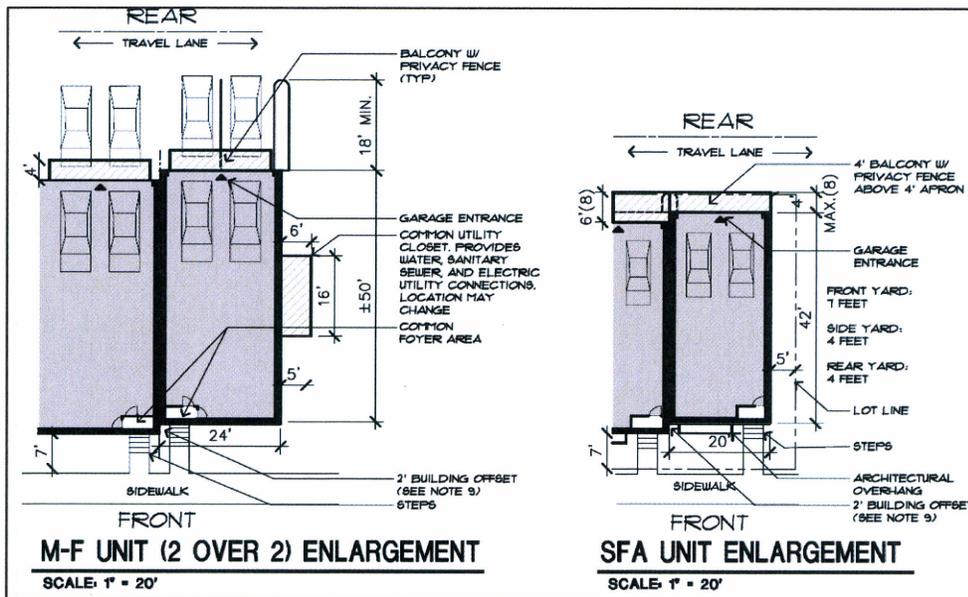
Detail of Garages- CDP/FDP Plan Page 6
